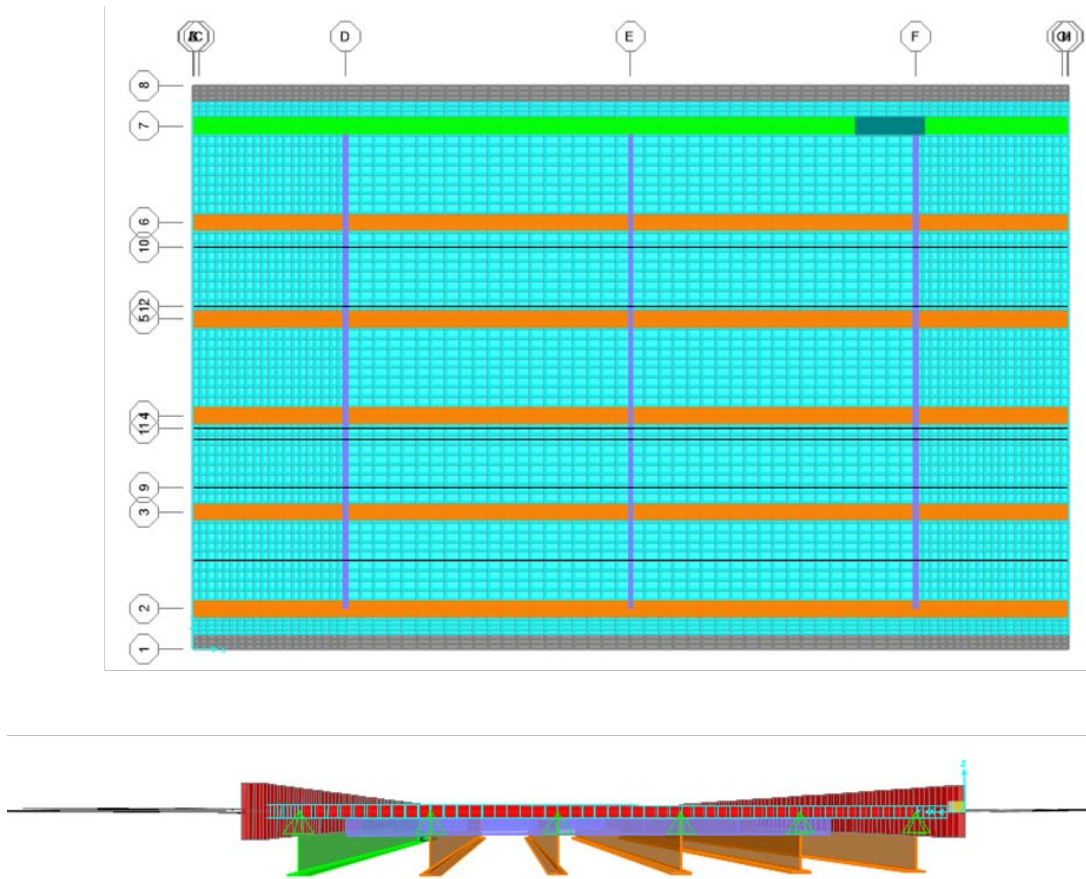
M-164 Bridge 3D FE model mesh: (a) Plan view and (b) 3D view
